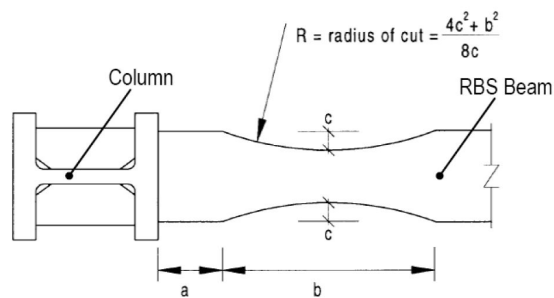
Reduced beam section connection (Engelhardt et al. 1998)
